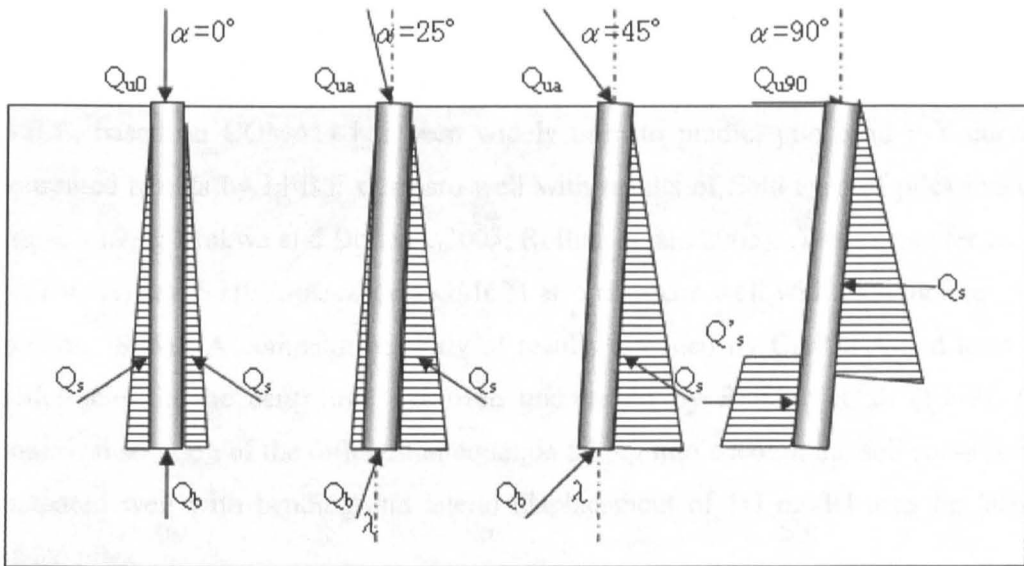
Force distribution on a pile under inclination loading (after Meyerhof and Ranjan, 1972)
